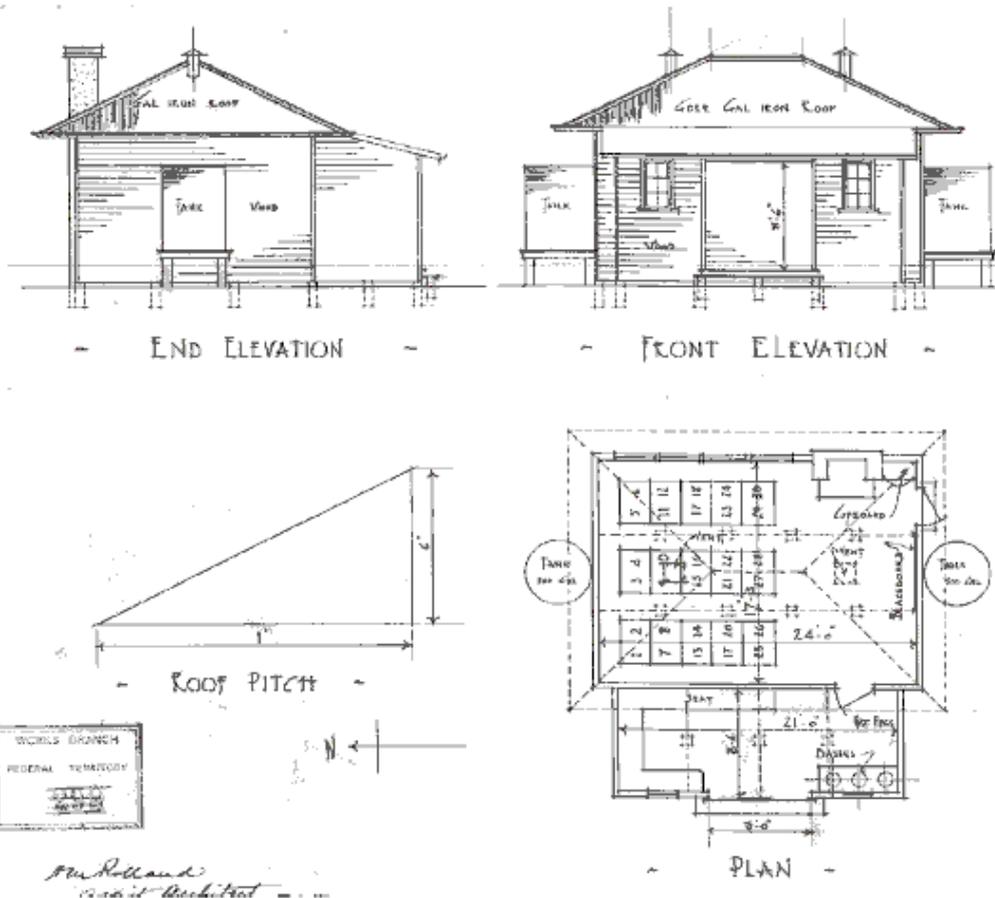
Plan of 1915 Gungahleen School (NAA A2502 AB402)
